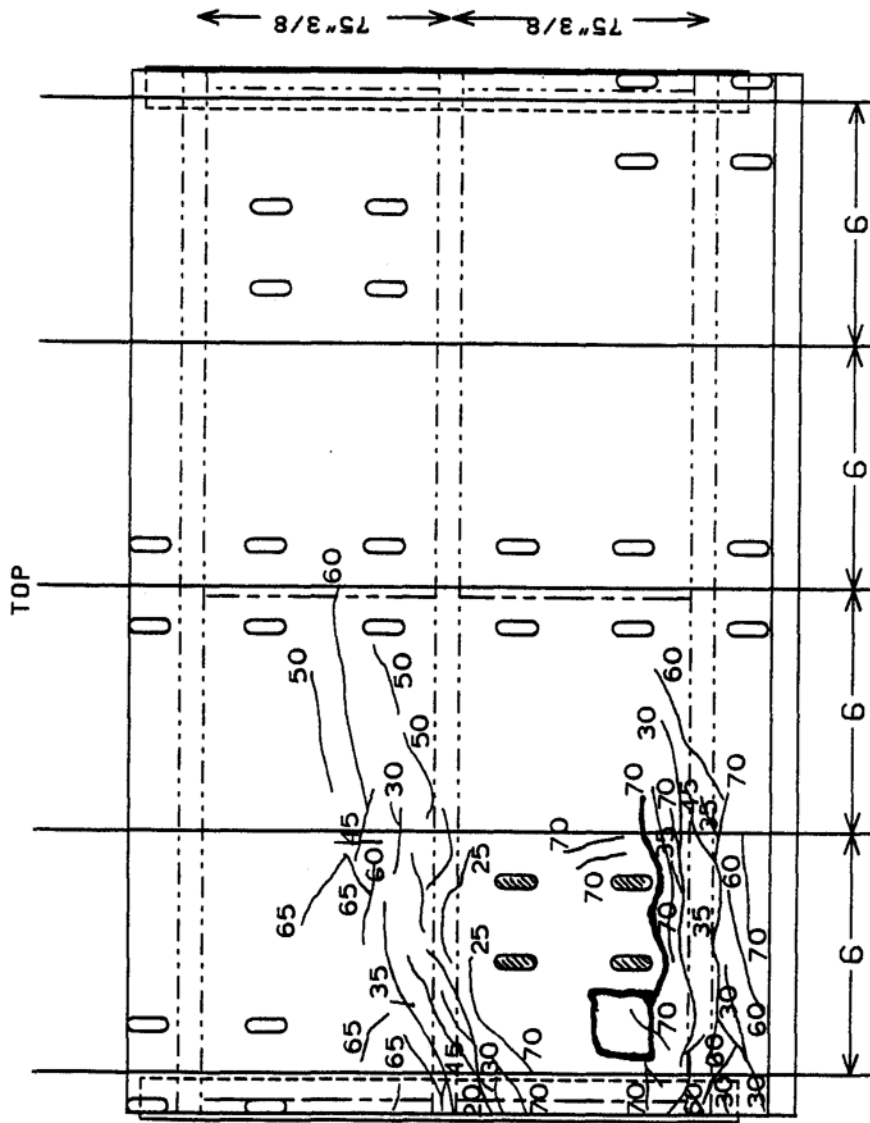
Top Cracking Pattern (Second Bridge - Test No. 6)
